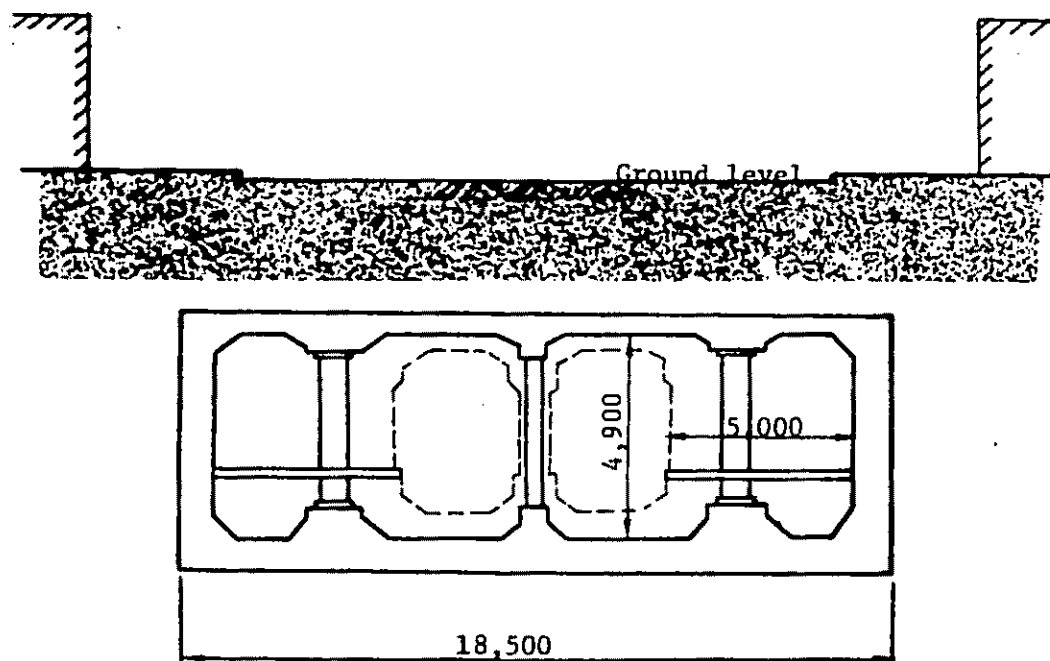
Typical Cross Section of Underground Single Level Station
